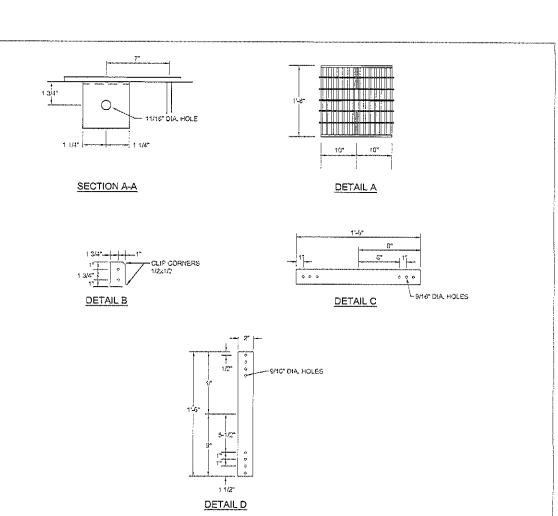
HOLE GROUND TAB DETAIL NOT TO SCALE
